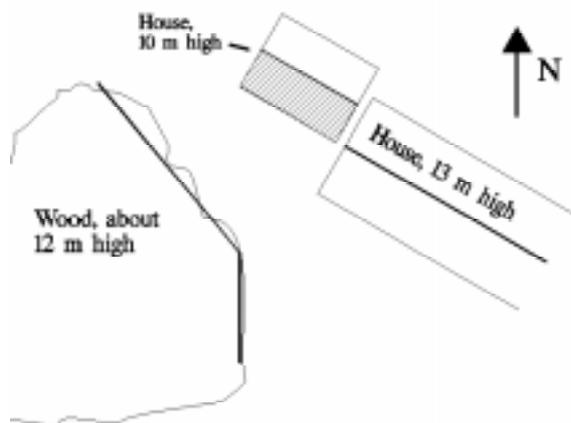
Ground plan of the building on which the collector shall be mounted and of the shading elements.
